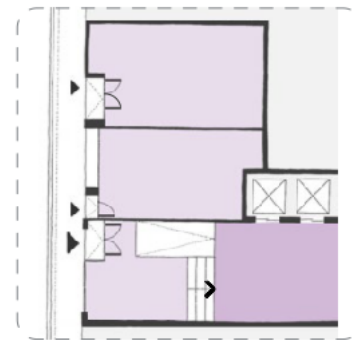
An example demonstrating floor level transitions in coastal flooding areas. It shows an active frontage with two small retail or cafe tenancies with their floor levels elevated above the existing footpath level, and steps and ramp inside the doorway which lead up to the lift lobby. The retail / cafe tenancies have reduced freeboard from coastal flooding, as agreed with the floodplain manager. The setback steps and ramps lead up to the lift lobby at or above NFPL for coastal flooding.
